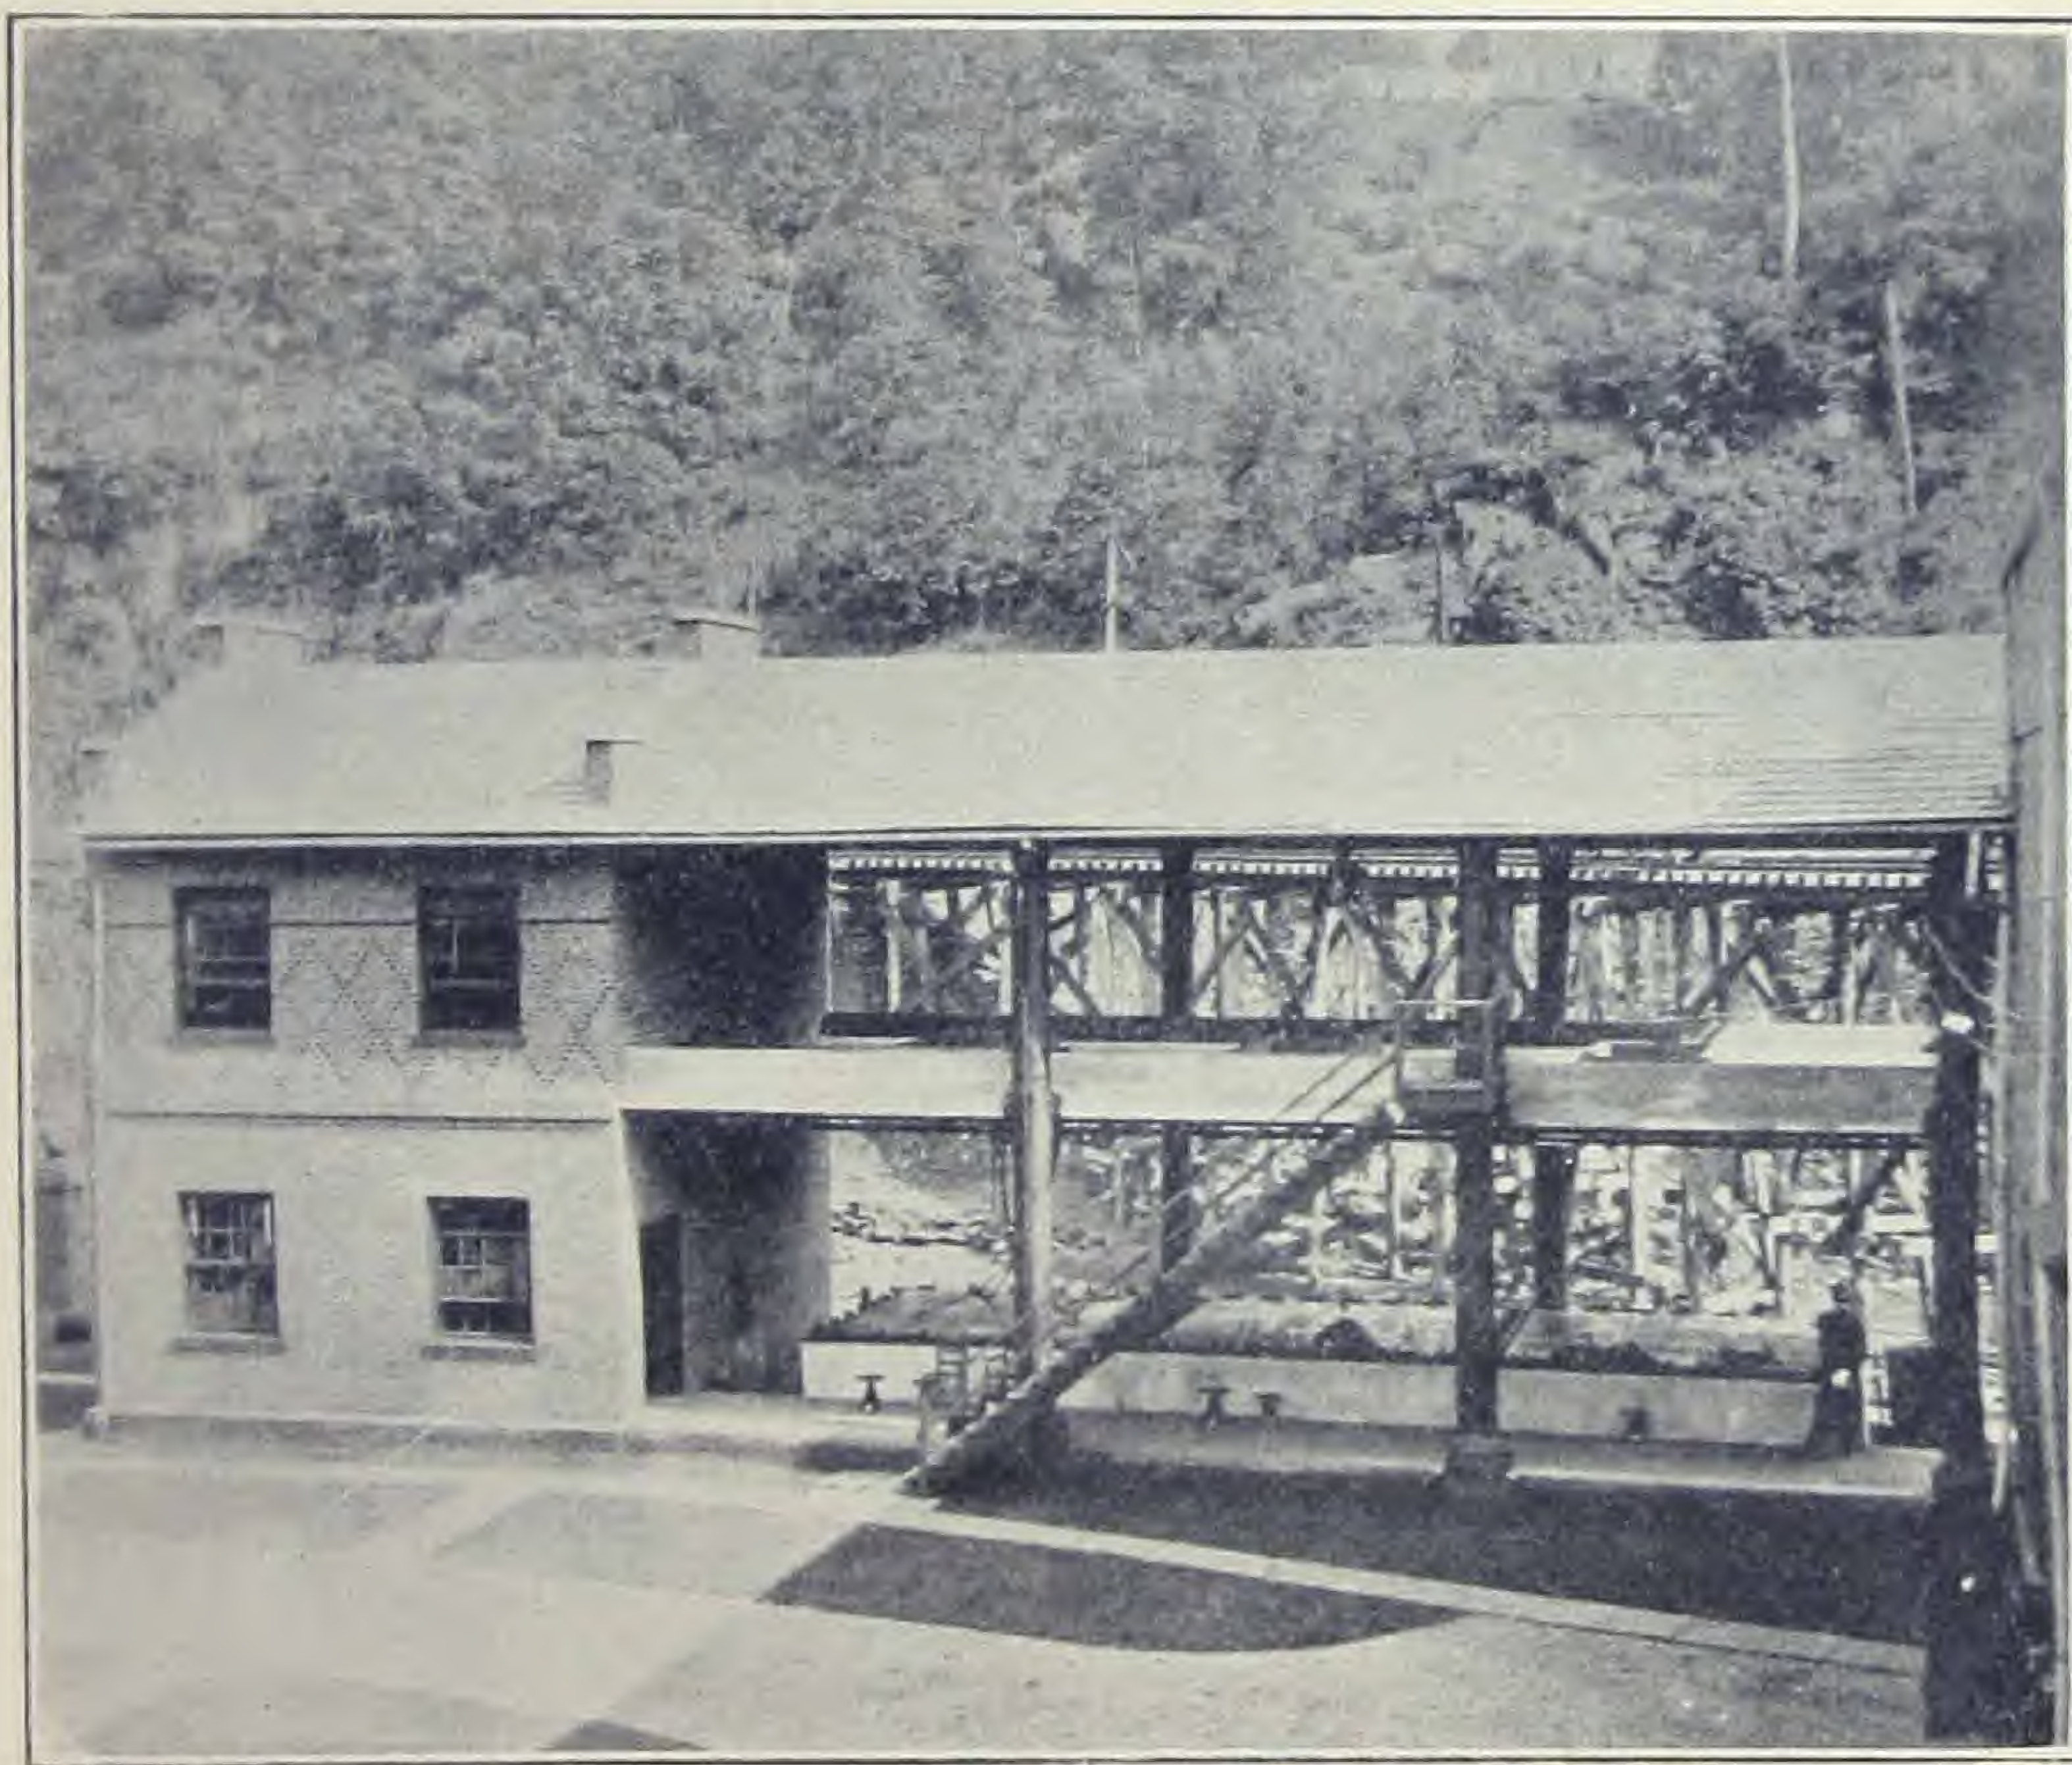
FIG. VIII. VIEW OF CONCRETE FLOOR PURIFIER HOUSE AND OFFICE.
